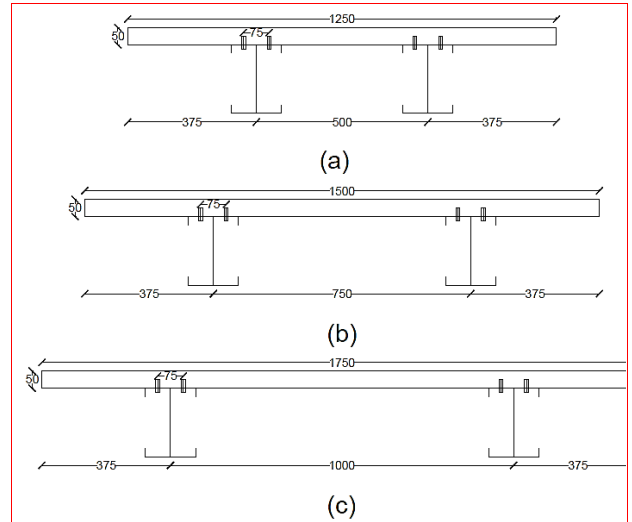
Cross-section of cold-formed steel and reinforced concrete composite beam (a) 500mm spaced beams; (b) 750mm spaced beams; (c) 1000mm spaced beams
